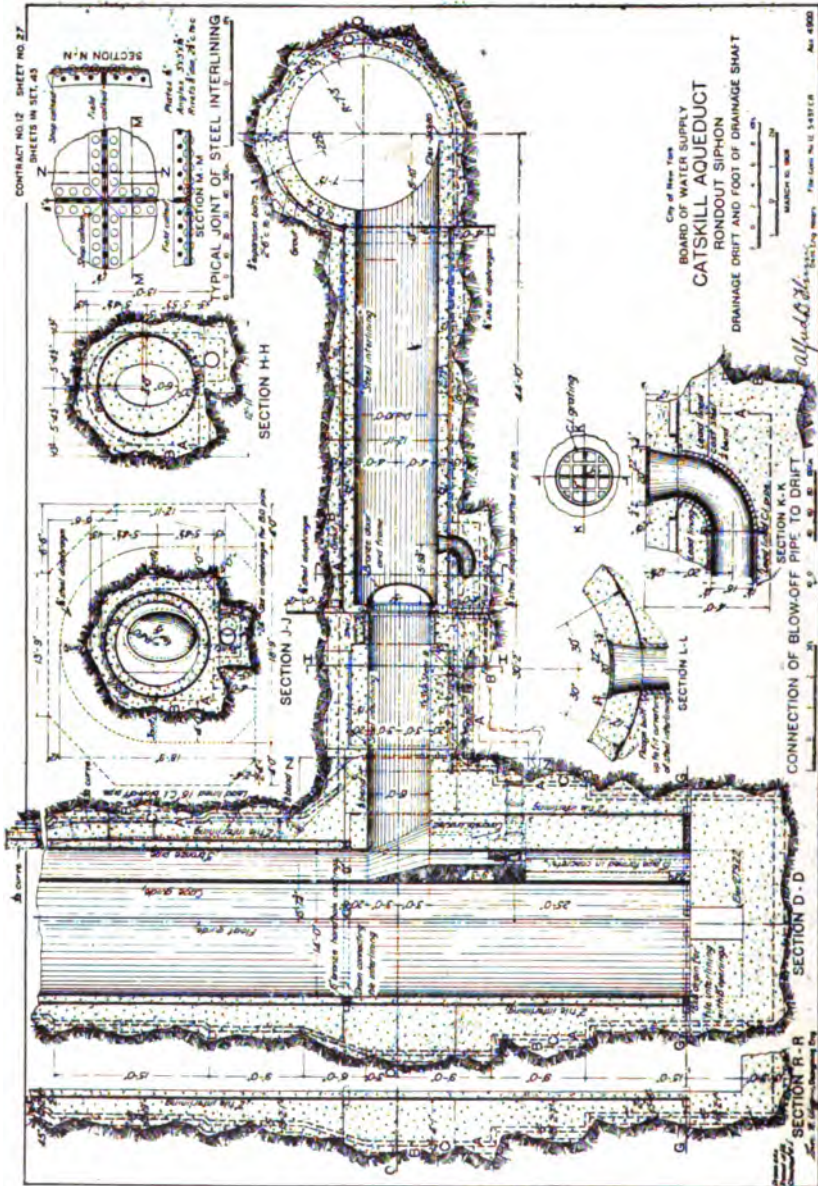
Rondout Siphon. Construction of Drainage Drift and Foot of Shaft.
